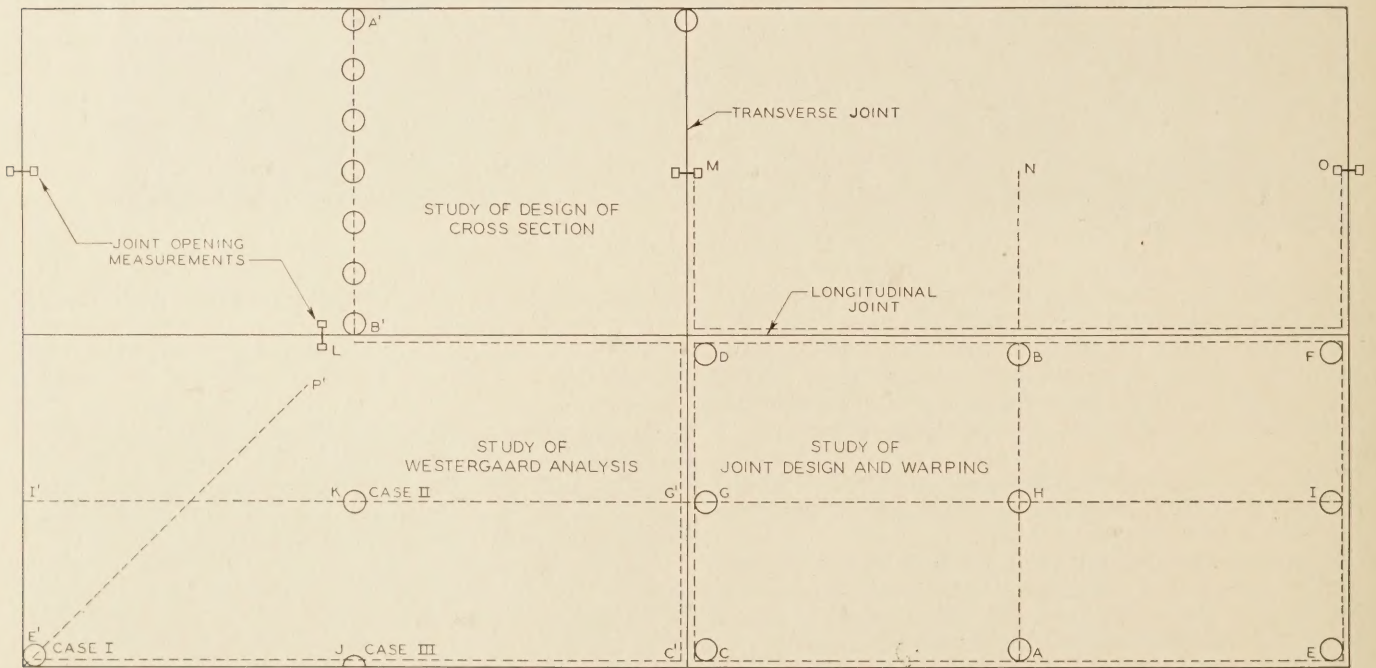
PLAN OF A 20- BY 40-FOOT TEST SECTION SHOWING THE POINTS WHERE LOADS WERE APPLIED AND THE LINES ALONG WHICH DEFLECTIONS WERE MEASURED.
